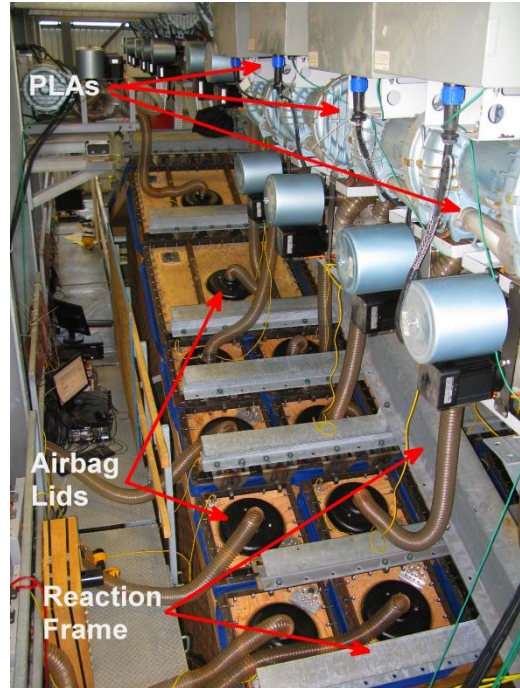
Photograph of the windward corner of the test house with the PLAs and air bags installed
